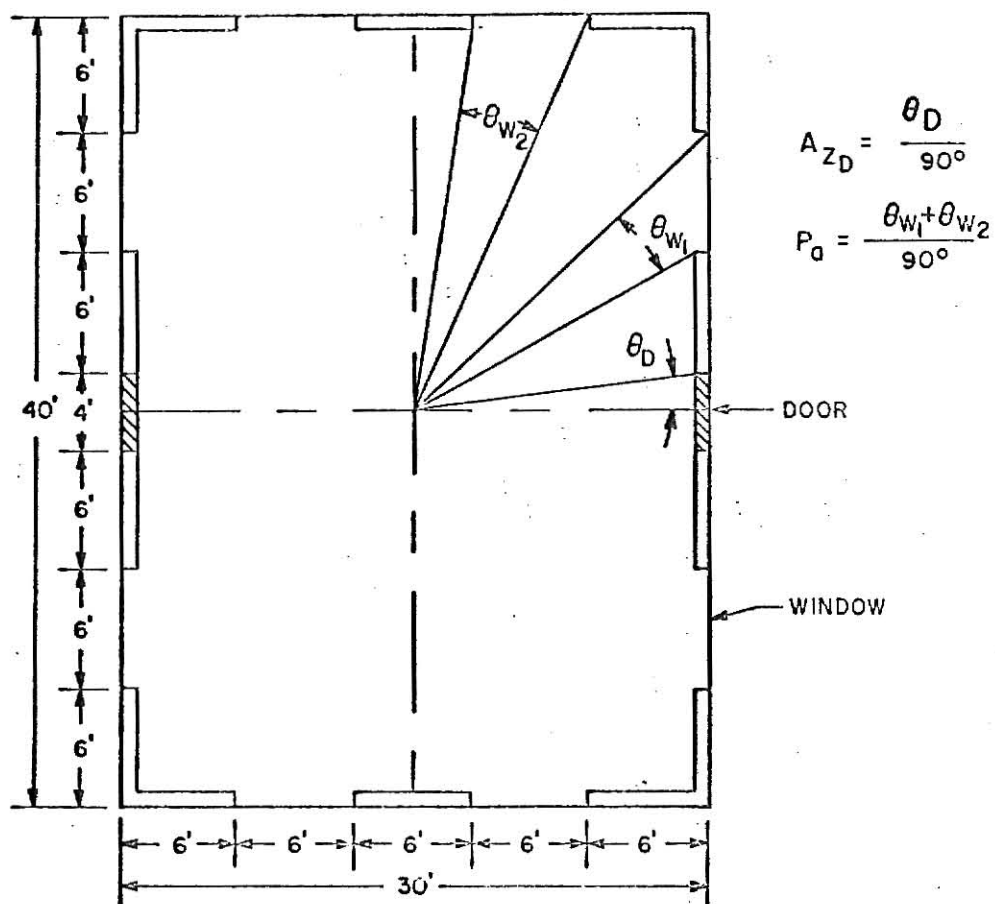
Plan of the test house showing azimuthal sectors for doors and windows.
